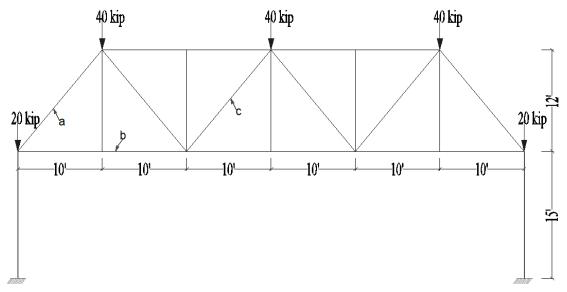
Two Dimensional View of the Bridge Truss (Pratt Type)
